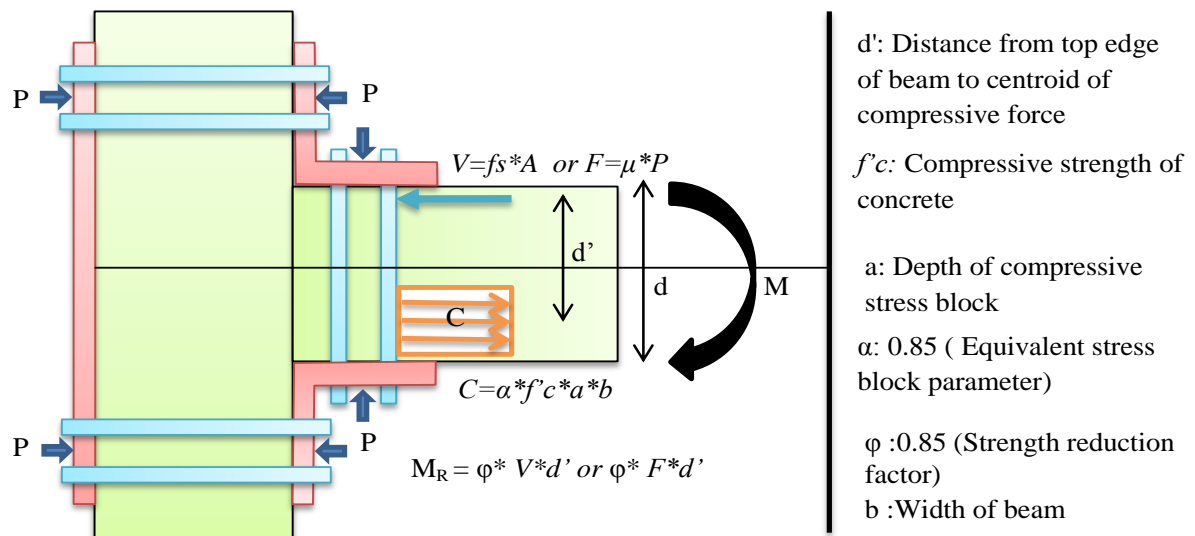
Force transfer mechanism through beam end to column connection (no gap between beam & column)
